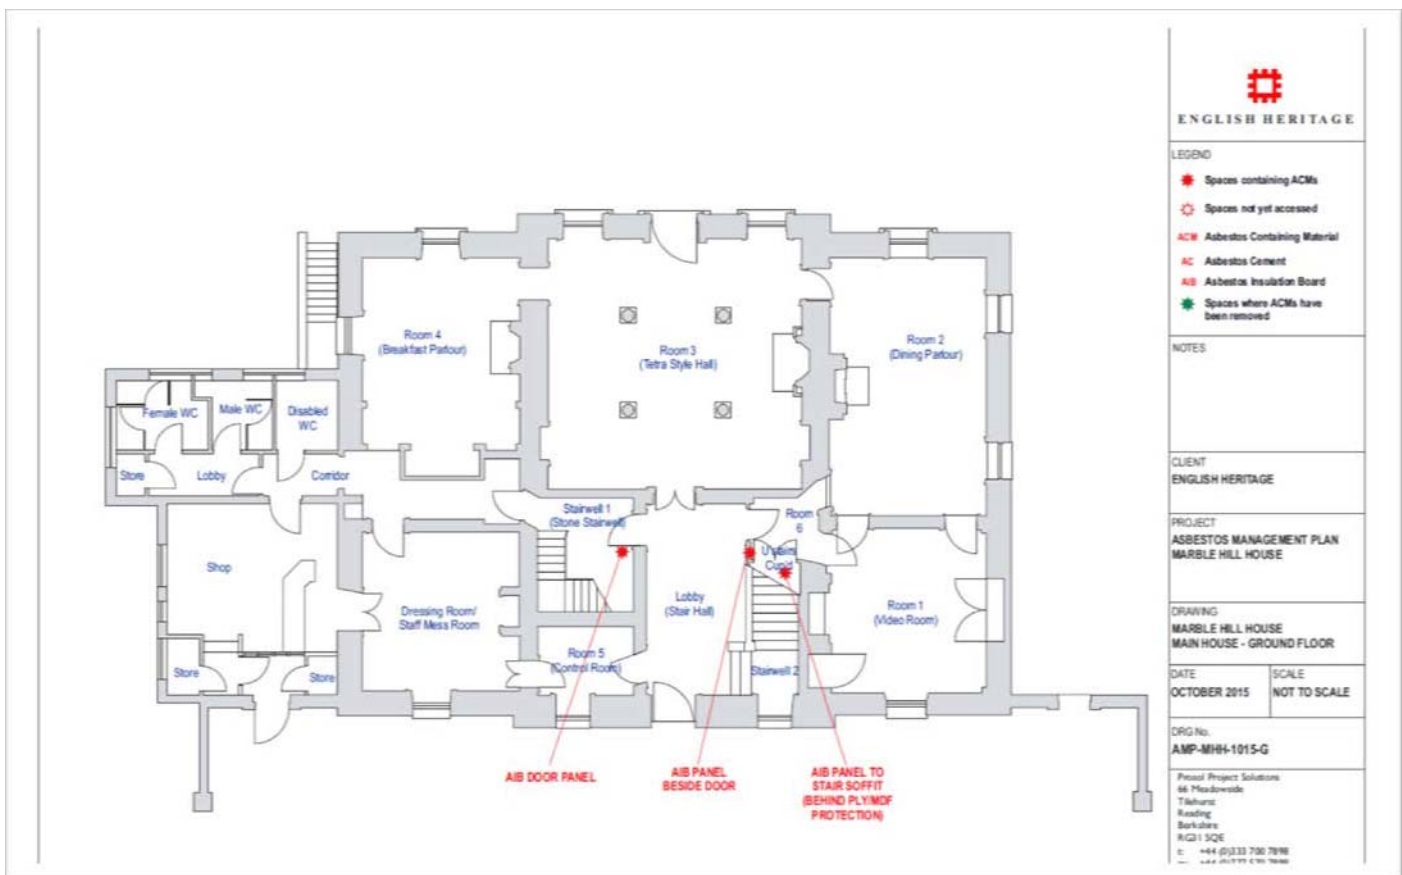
Ground Floor Plan, showing three doors with existing asbestos panels.
